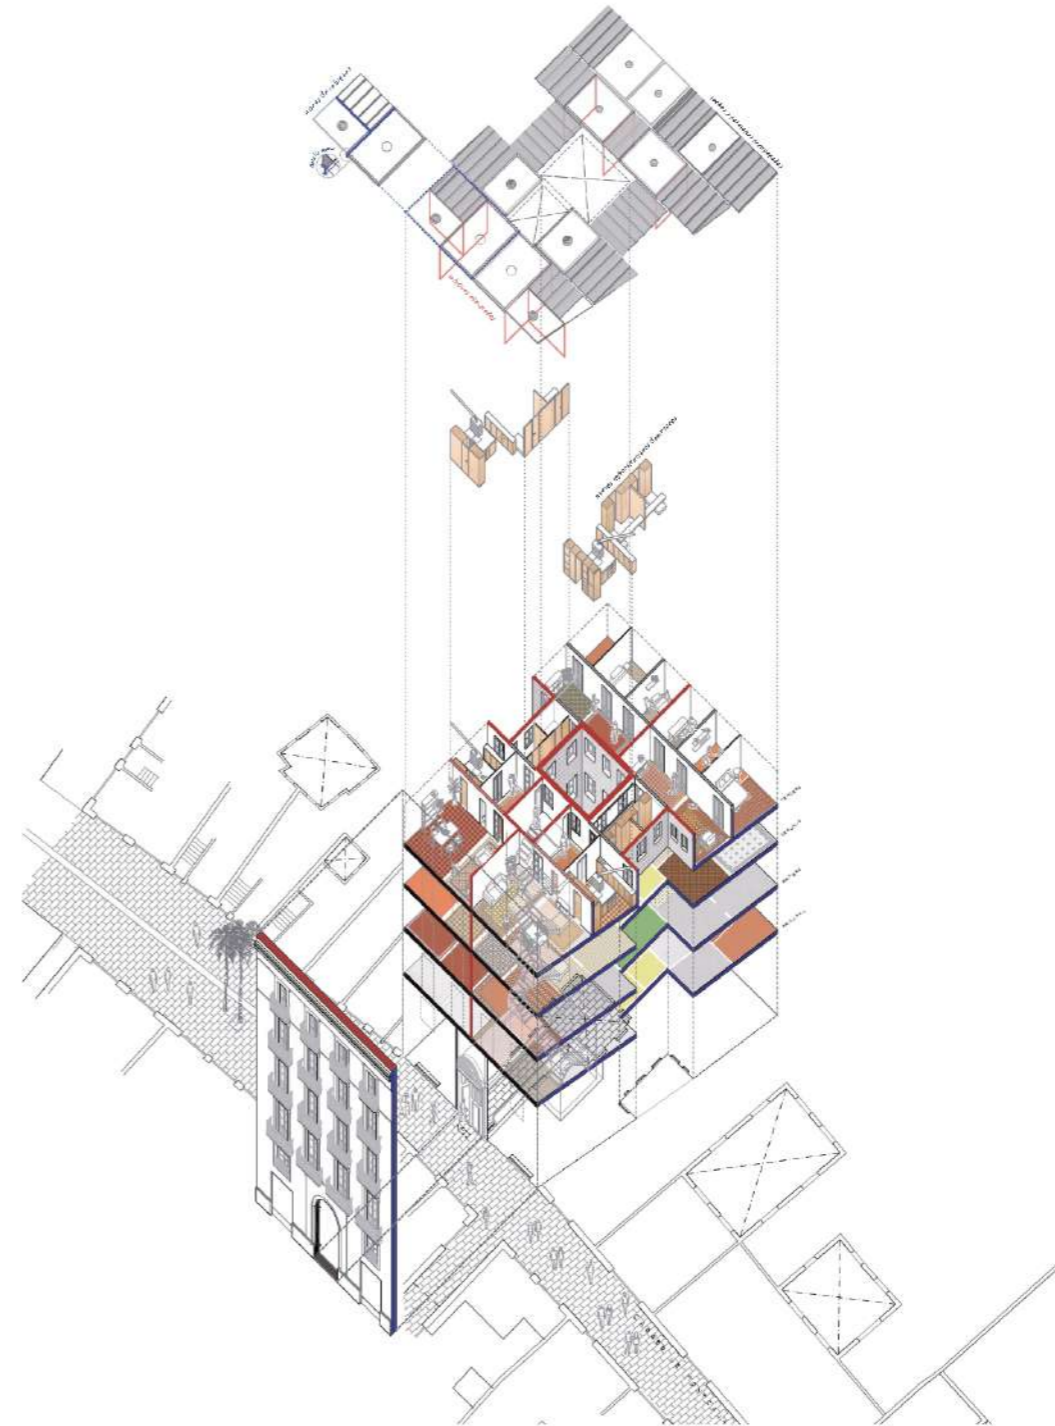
Exploded axonometrical drawing of the building to show the components, furniture, and ceilings of a typical floor.
